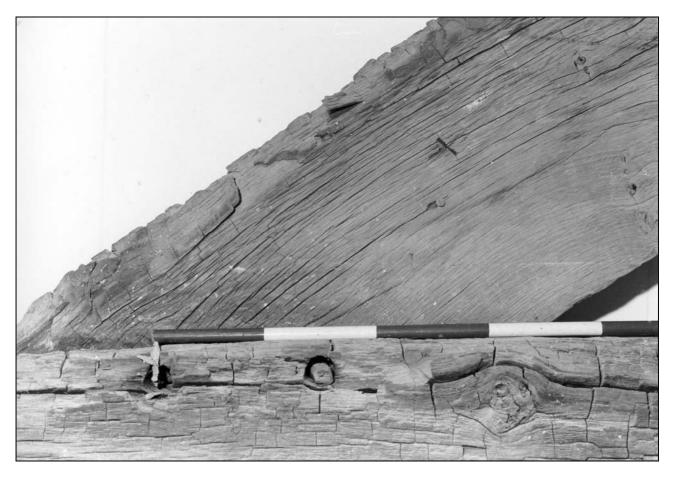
Detail of carpenter's numbering at foot of principal rafter, truss Z (film 1, frame 14)
